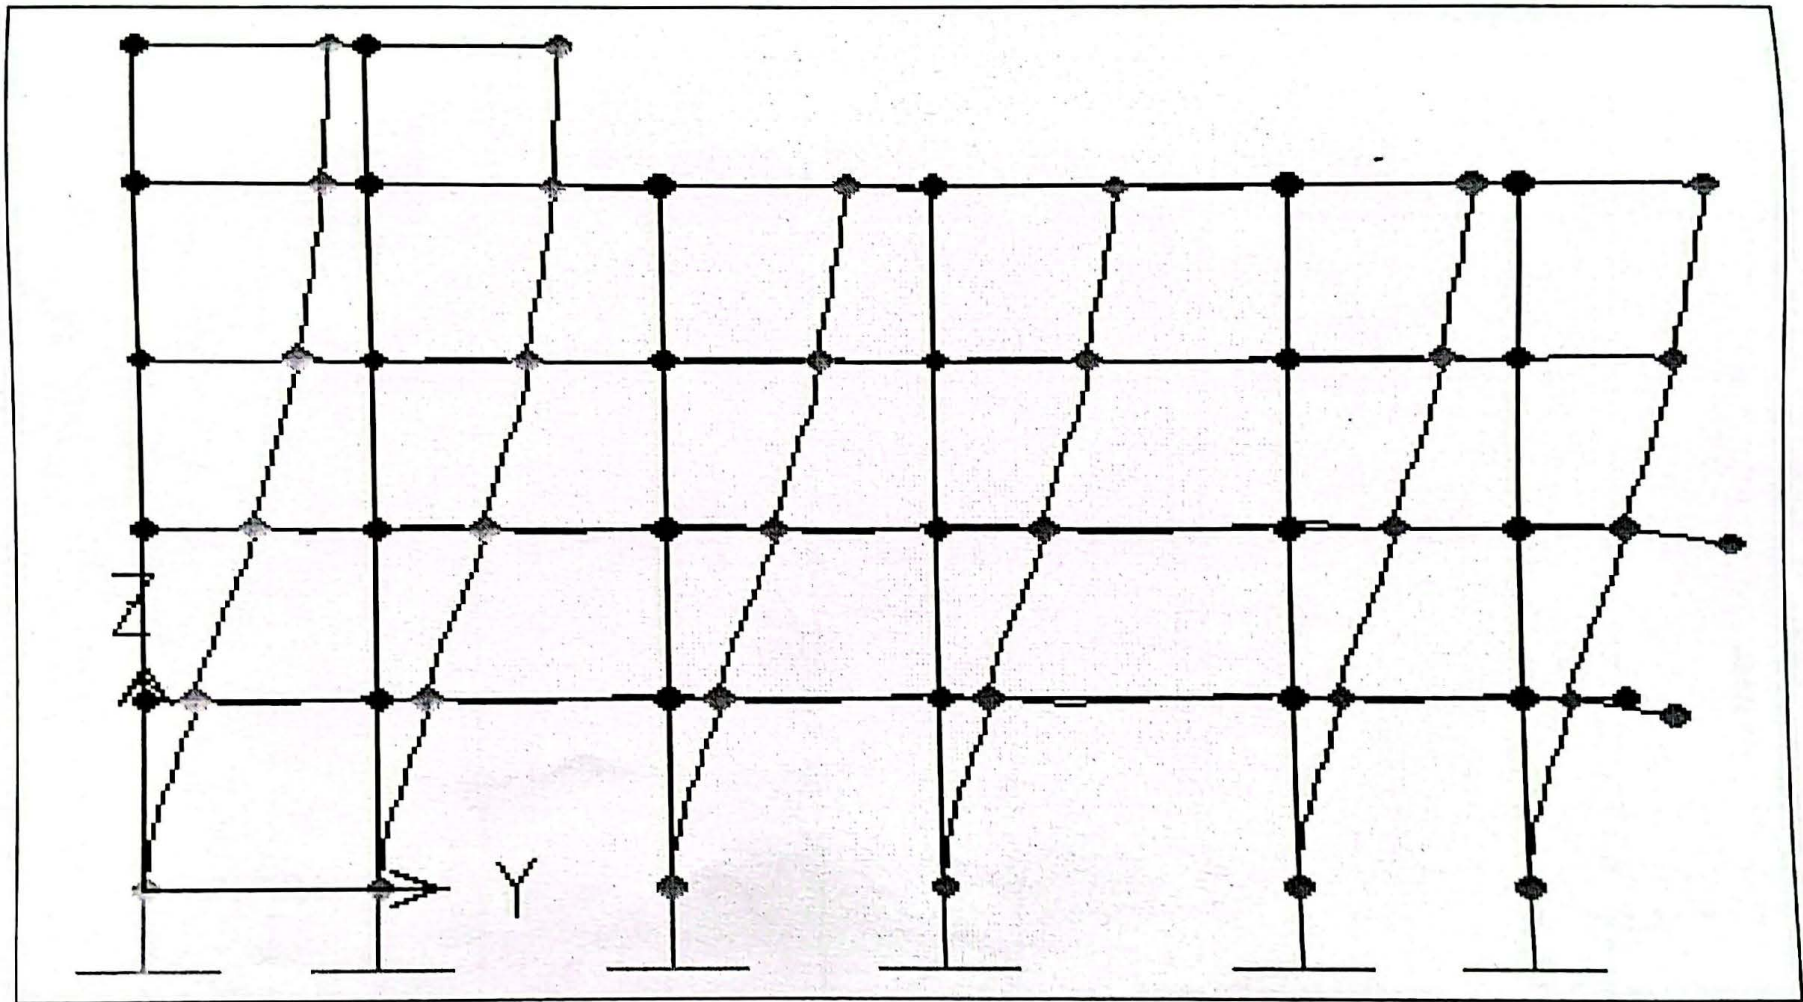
SHOWING DEFORMED SHAPE IN FRAME 4-4 DUE TO EQPY
